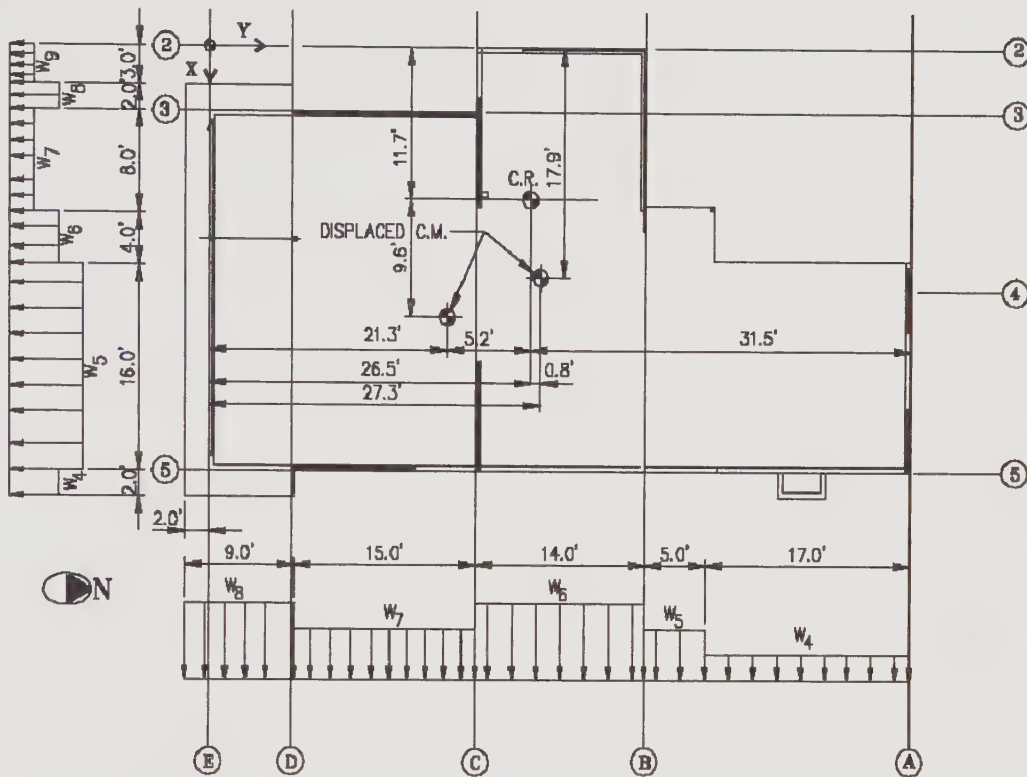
B-14. Second floor diaphragm centers of rigidity and mass
